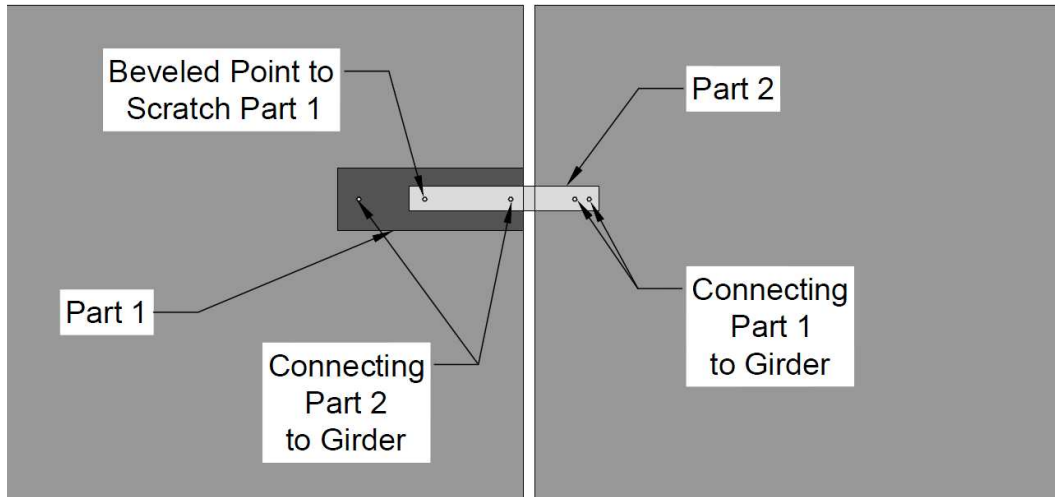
Sketch of Elevation View of Deck Joint after Installation
